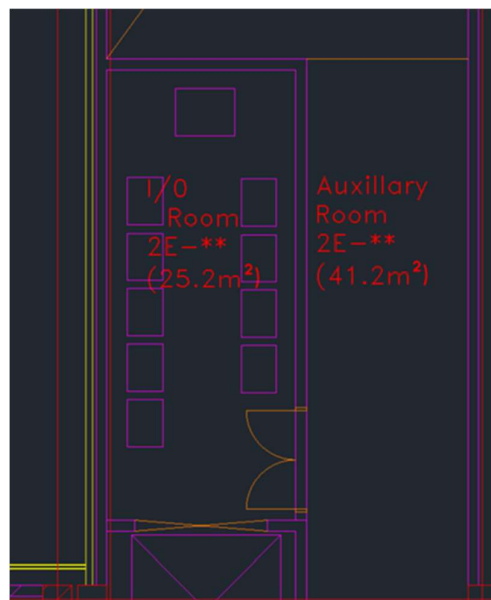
Plan of Proposed Second Floor I/O Room with DeltaV Controller and I/O Cabinets Shown
